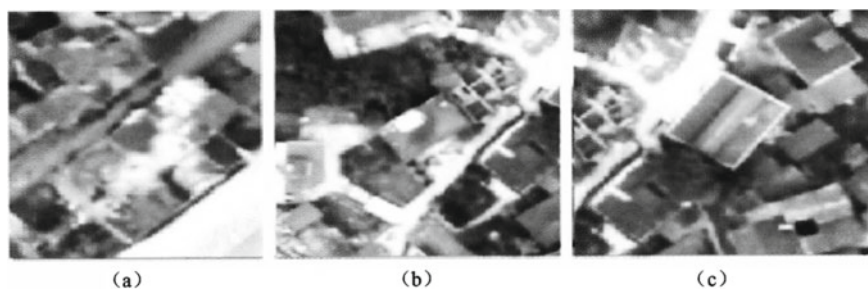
Remote sensing interpretation symbols of the brick-concrete buildings damage degree a complete collapse; b severe damage; c general damage
